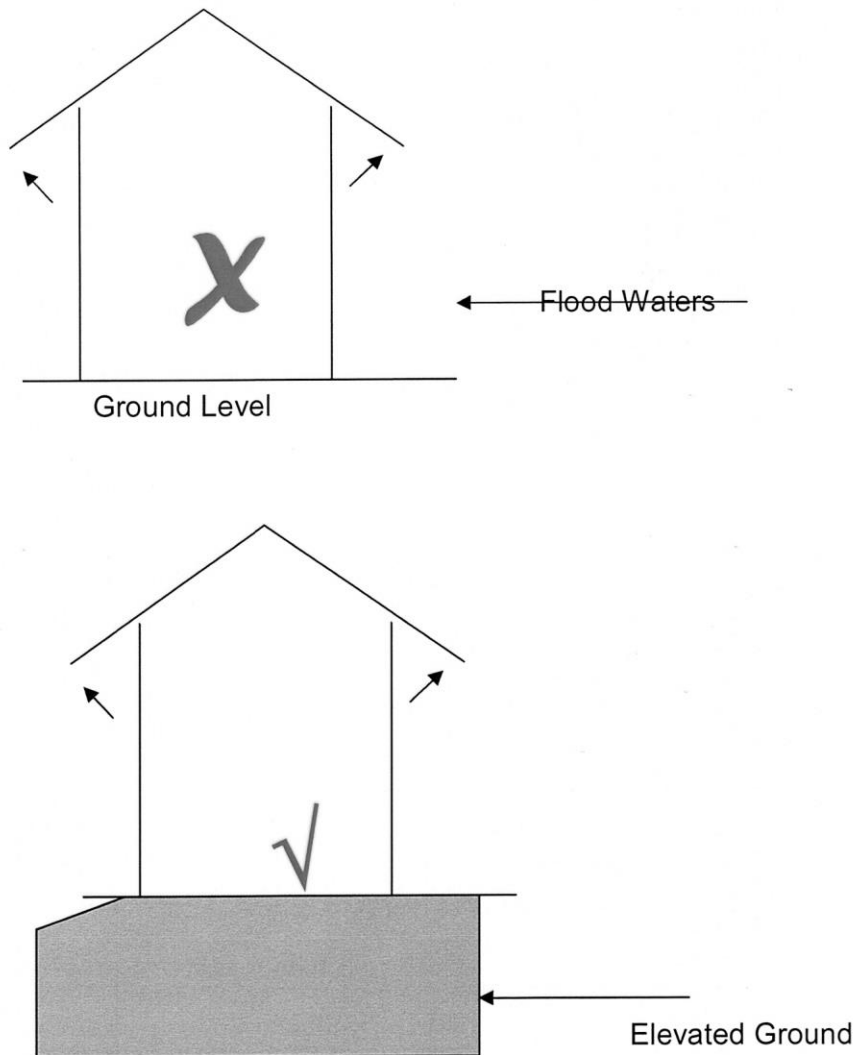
Construction on stilts or on artificially raised earth mounds.
